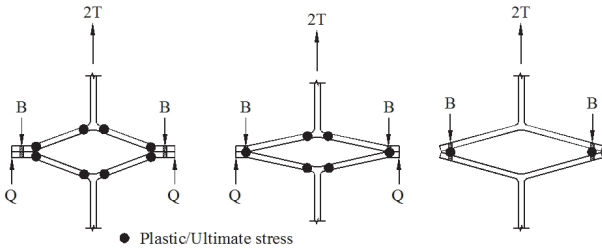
T-Stub failure modes; (a) Flange plastic mechanism, (b) Combined bolt/flange mechanism, (c) Bolt mechanism
